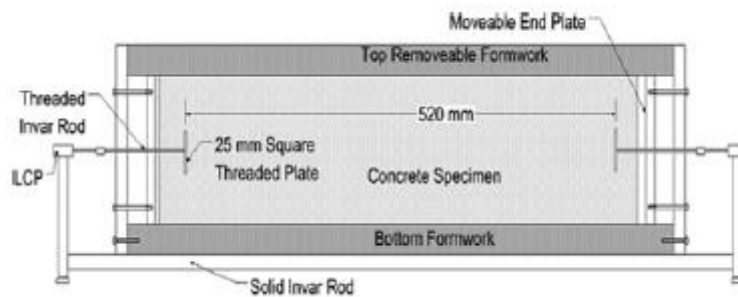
Schematic Free deformation frame (Riding et al. 2008).
